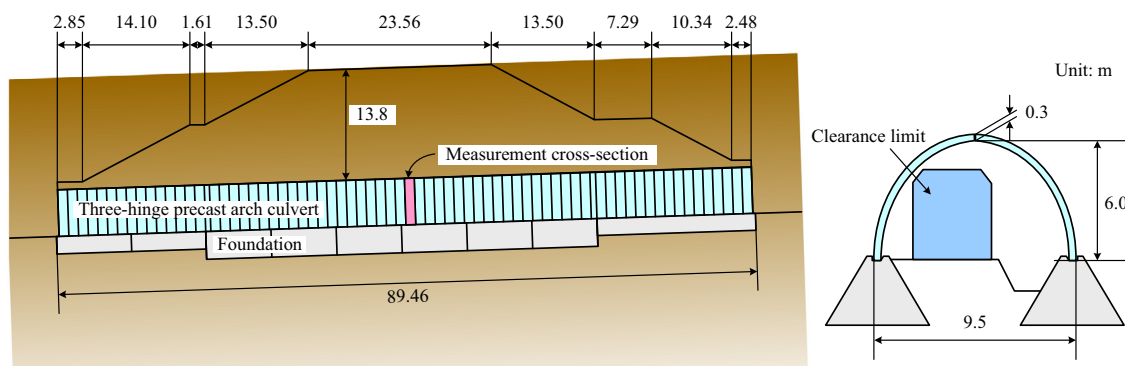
Schematic of in-situ construction and measurement cross-section.
